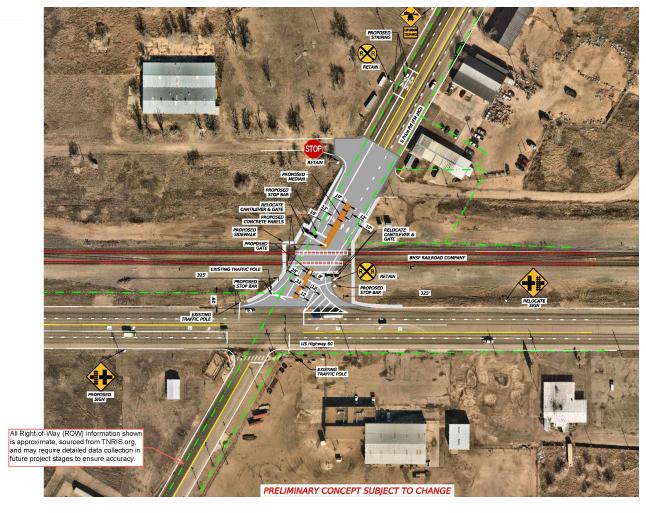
BNSF Crossing (DOT# 014549X) Improvement
